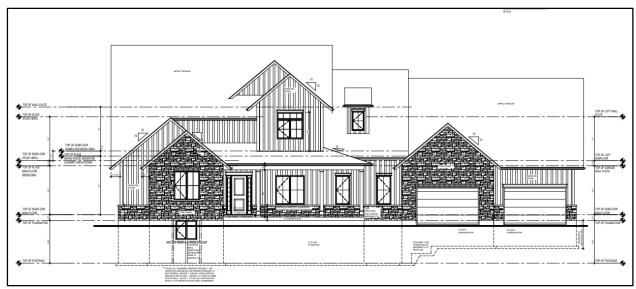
The Proposed Front Elevation of The Dwelling Unit
